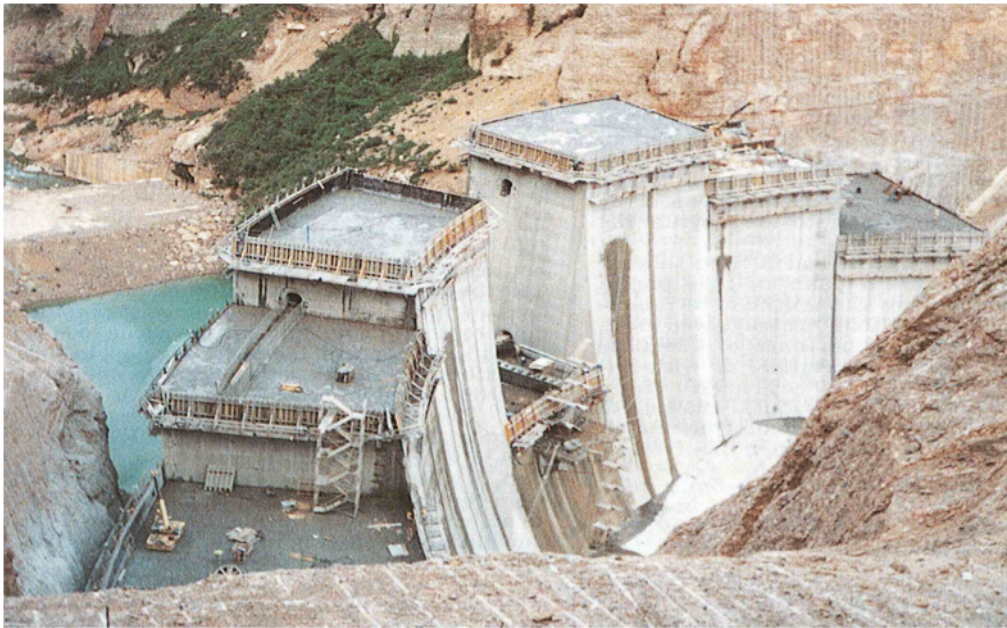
CVC Dam Construction in Vertical Monoliths
